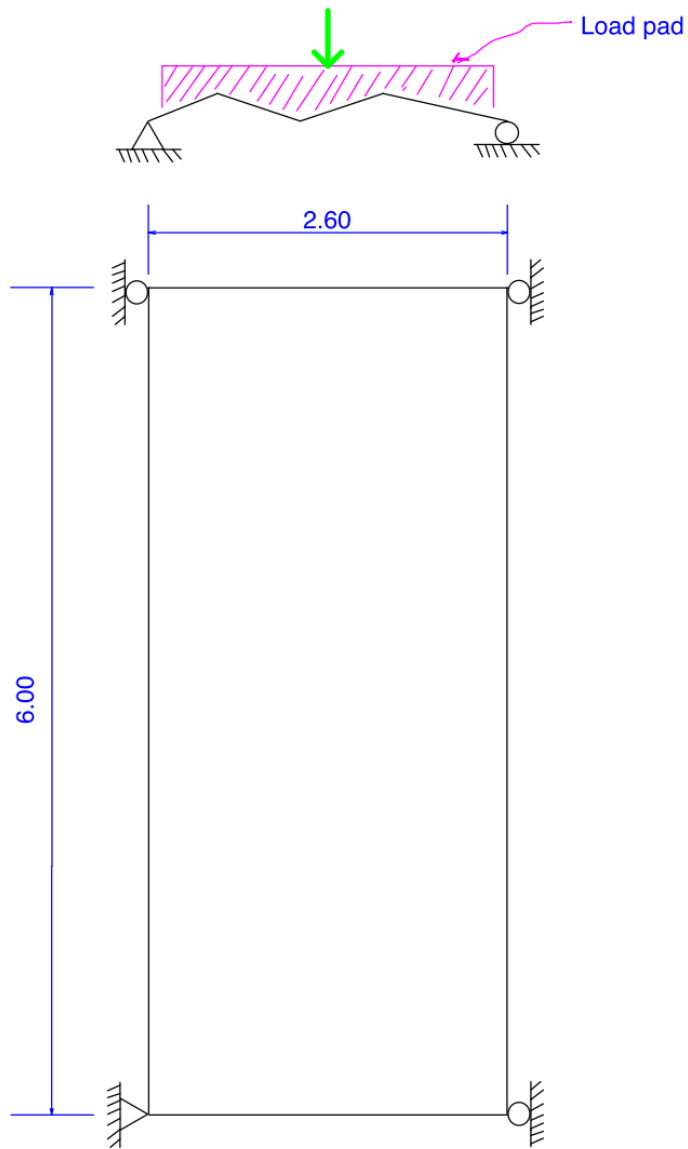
B – Test specimen for C1 and C2 mechanical resistance tests
